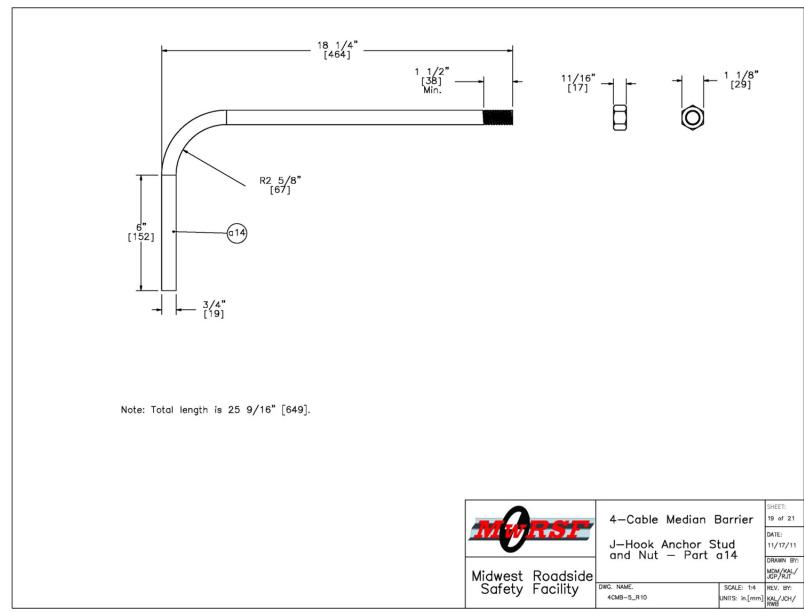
Anchor Stud Detail, Test No. 4CMB-5
